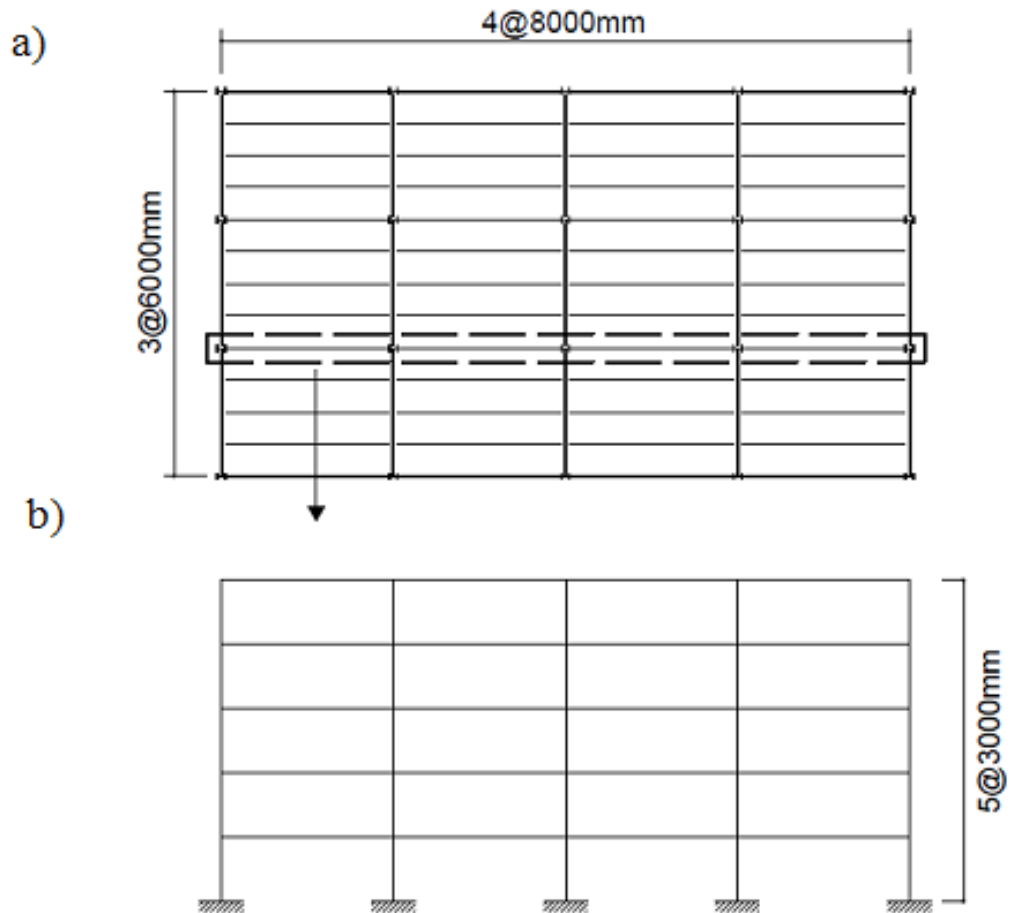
(a) Plan view of prototype building; (b) elevation of interior MRF (Dimopoulos et al 2013)
